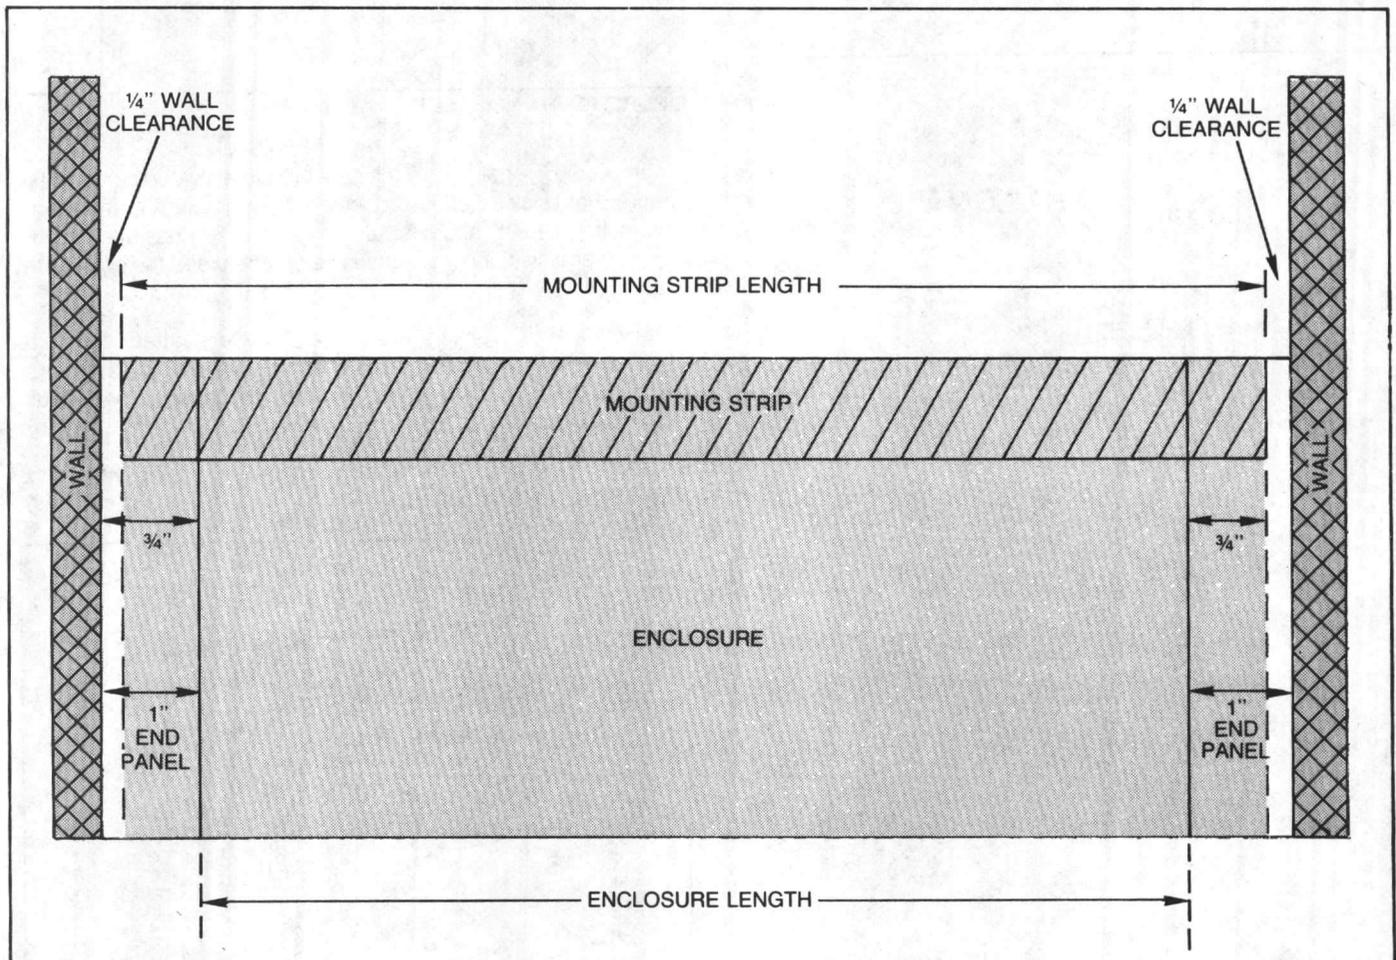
Wall-to-Wall Installation with End Panels (Front View)
